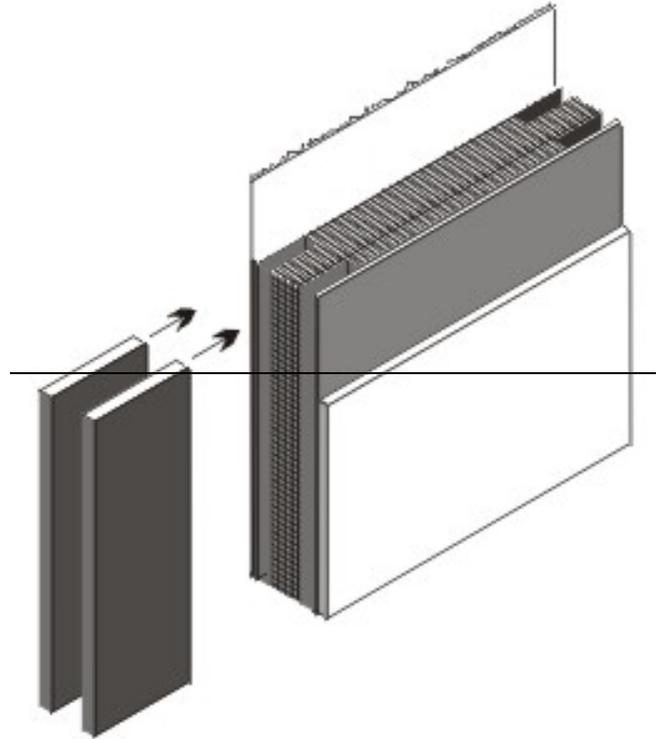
Structurally Insulated Wall Panels (SIPS)
